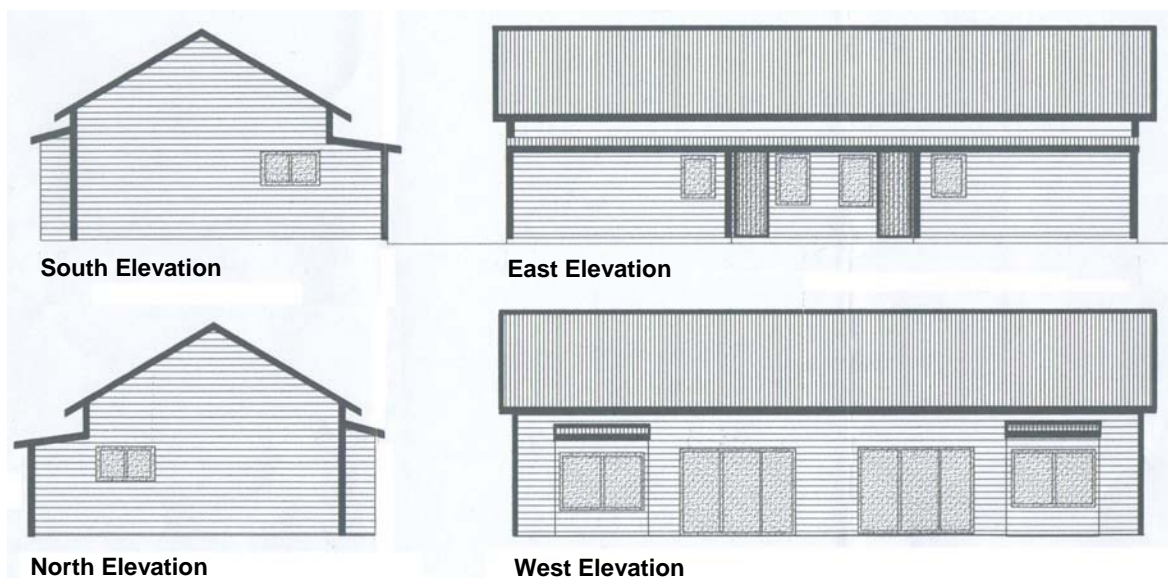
Elevations of the 114m<sup>2</sup> dwelling
